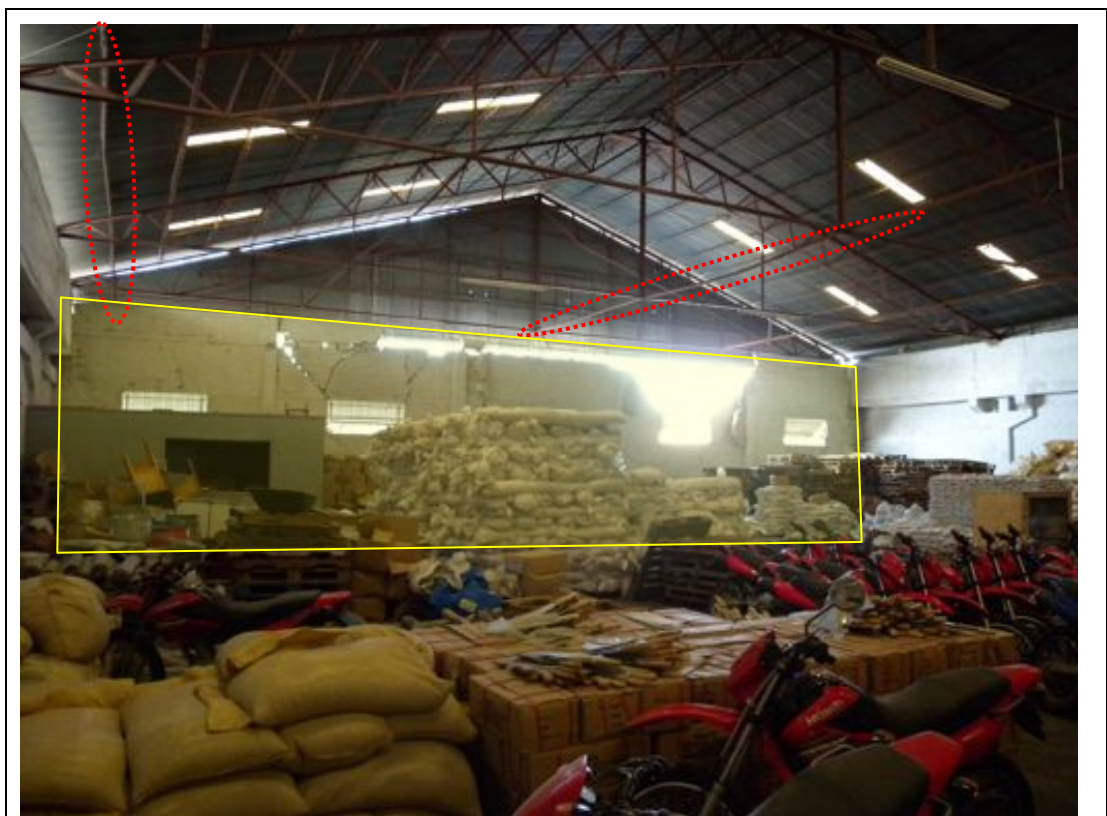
Partially collapsed rear warehouse portion – note that the warehouse is still being used extensively.
